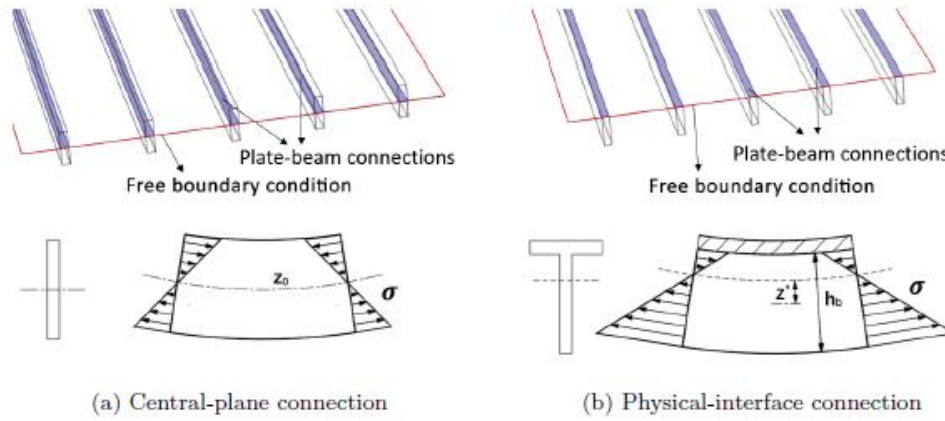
Plate-beam connections and the neutral plane of the joist structure.
